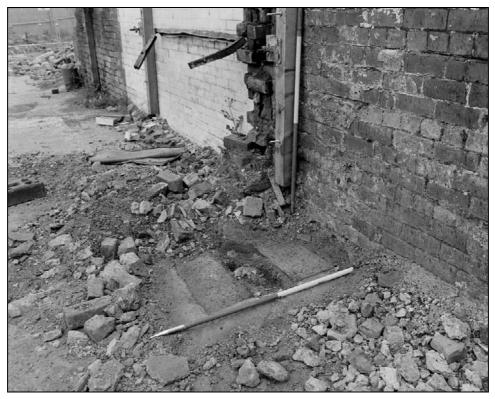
Detail of base scar within secondary concrete floor, northwest corner of G11, furnace house (film 51.8)
